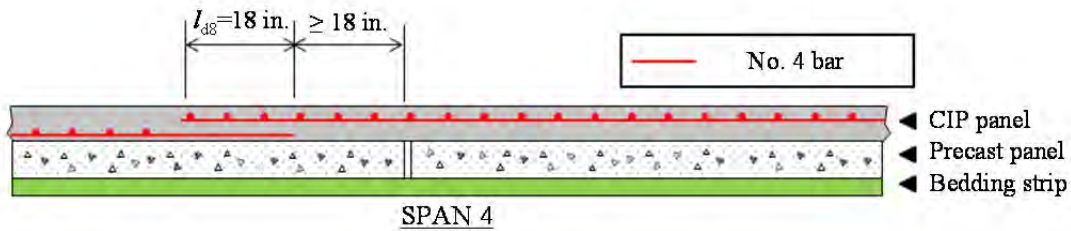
Details of longitudinal splices, Lampasas River Bridge (Section K-K)
